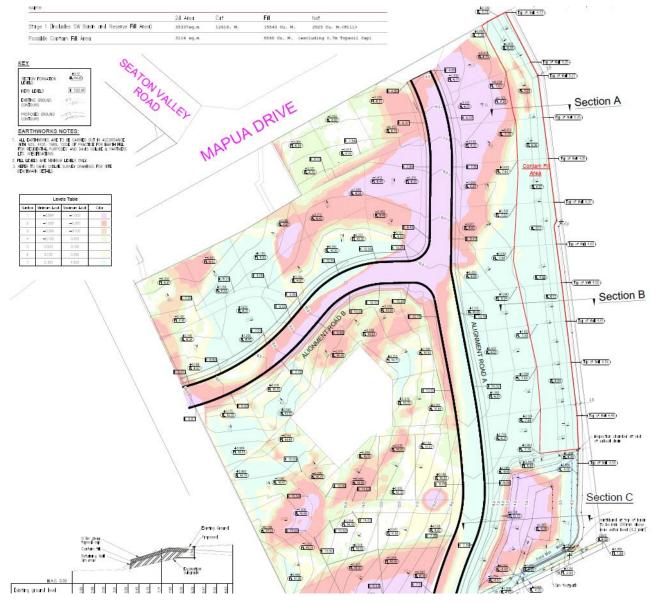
Location of retaining wall and stormwater pond (from: Davis Ogilvie Drawing 101 issue L)
